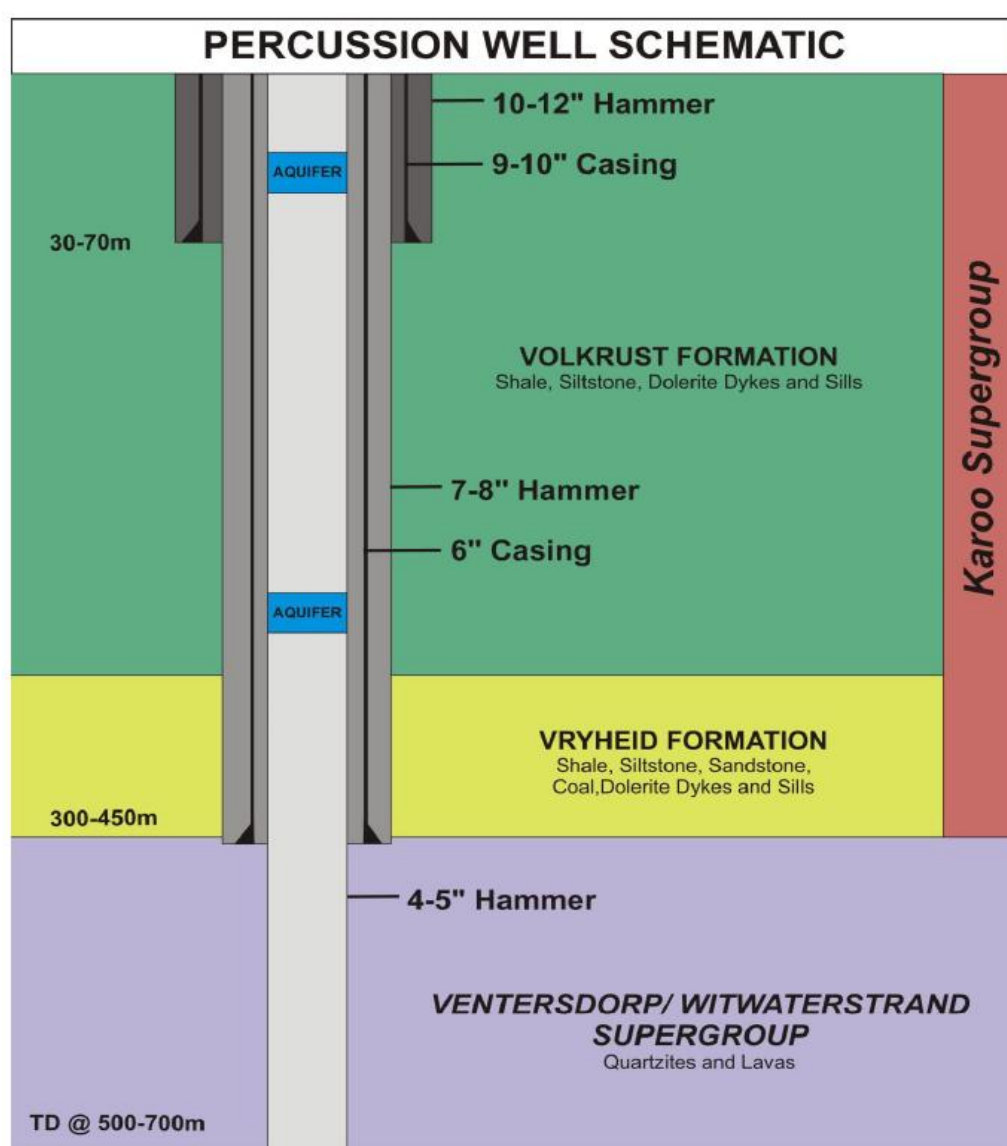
Schematic section indicating a typical well construction (after iLEH, 2017).
